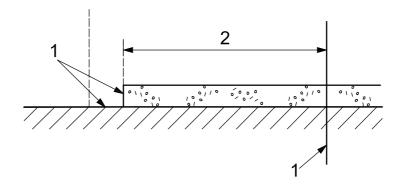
Model for calculation of linear thermal transmittance of wall/floor junction
